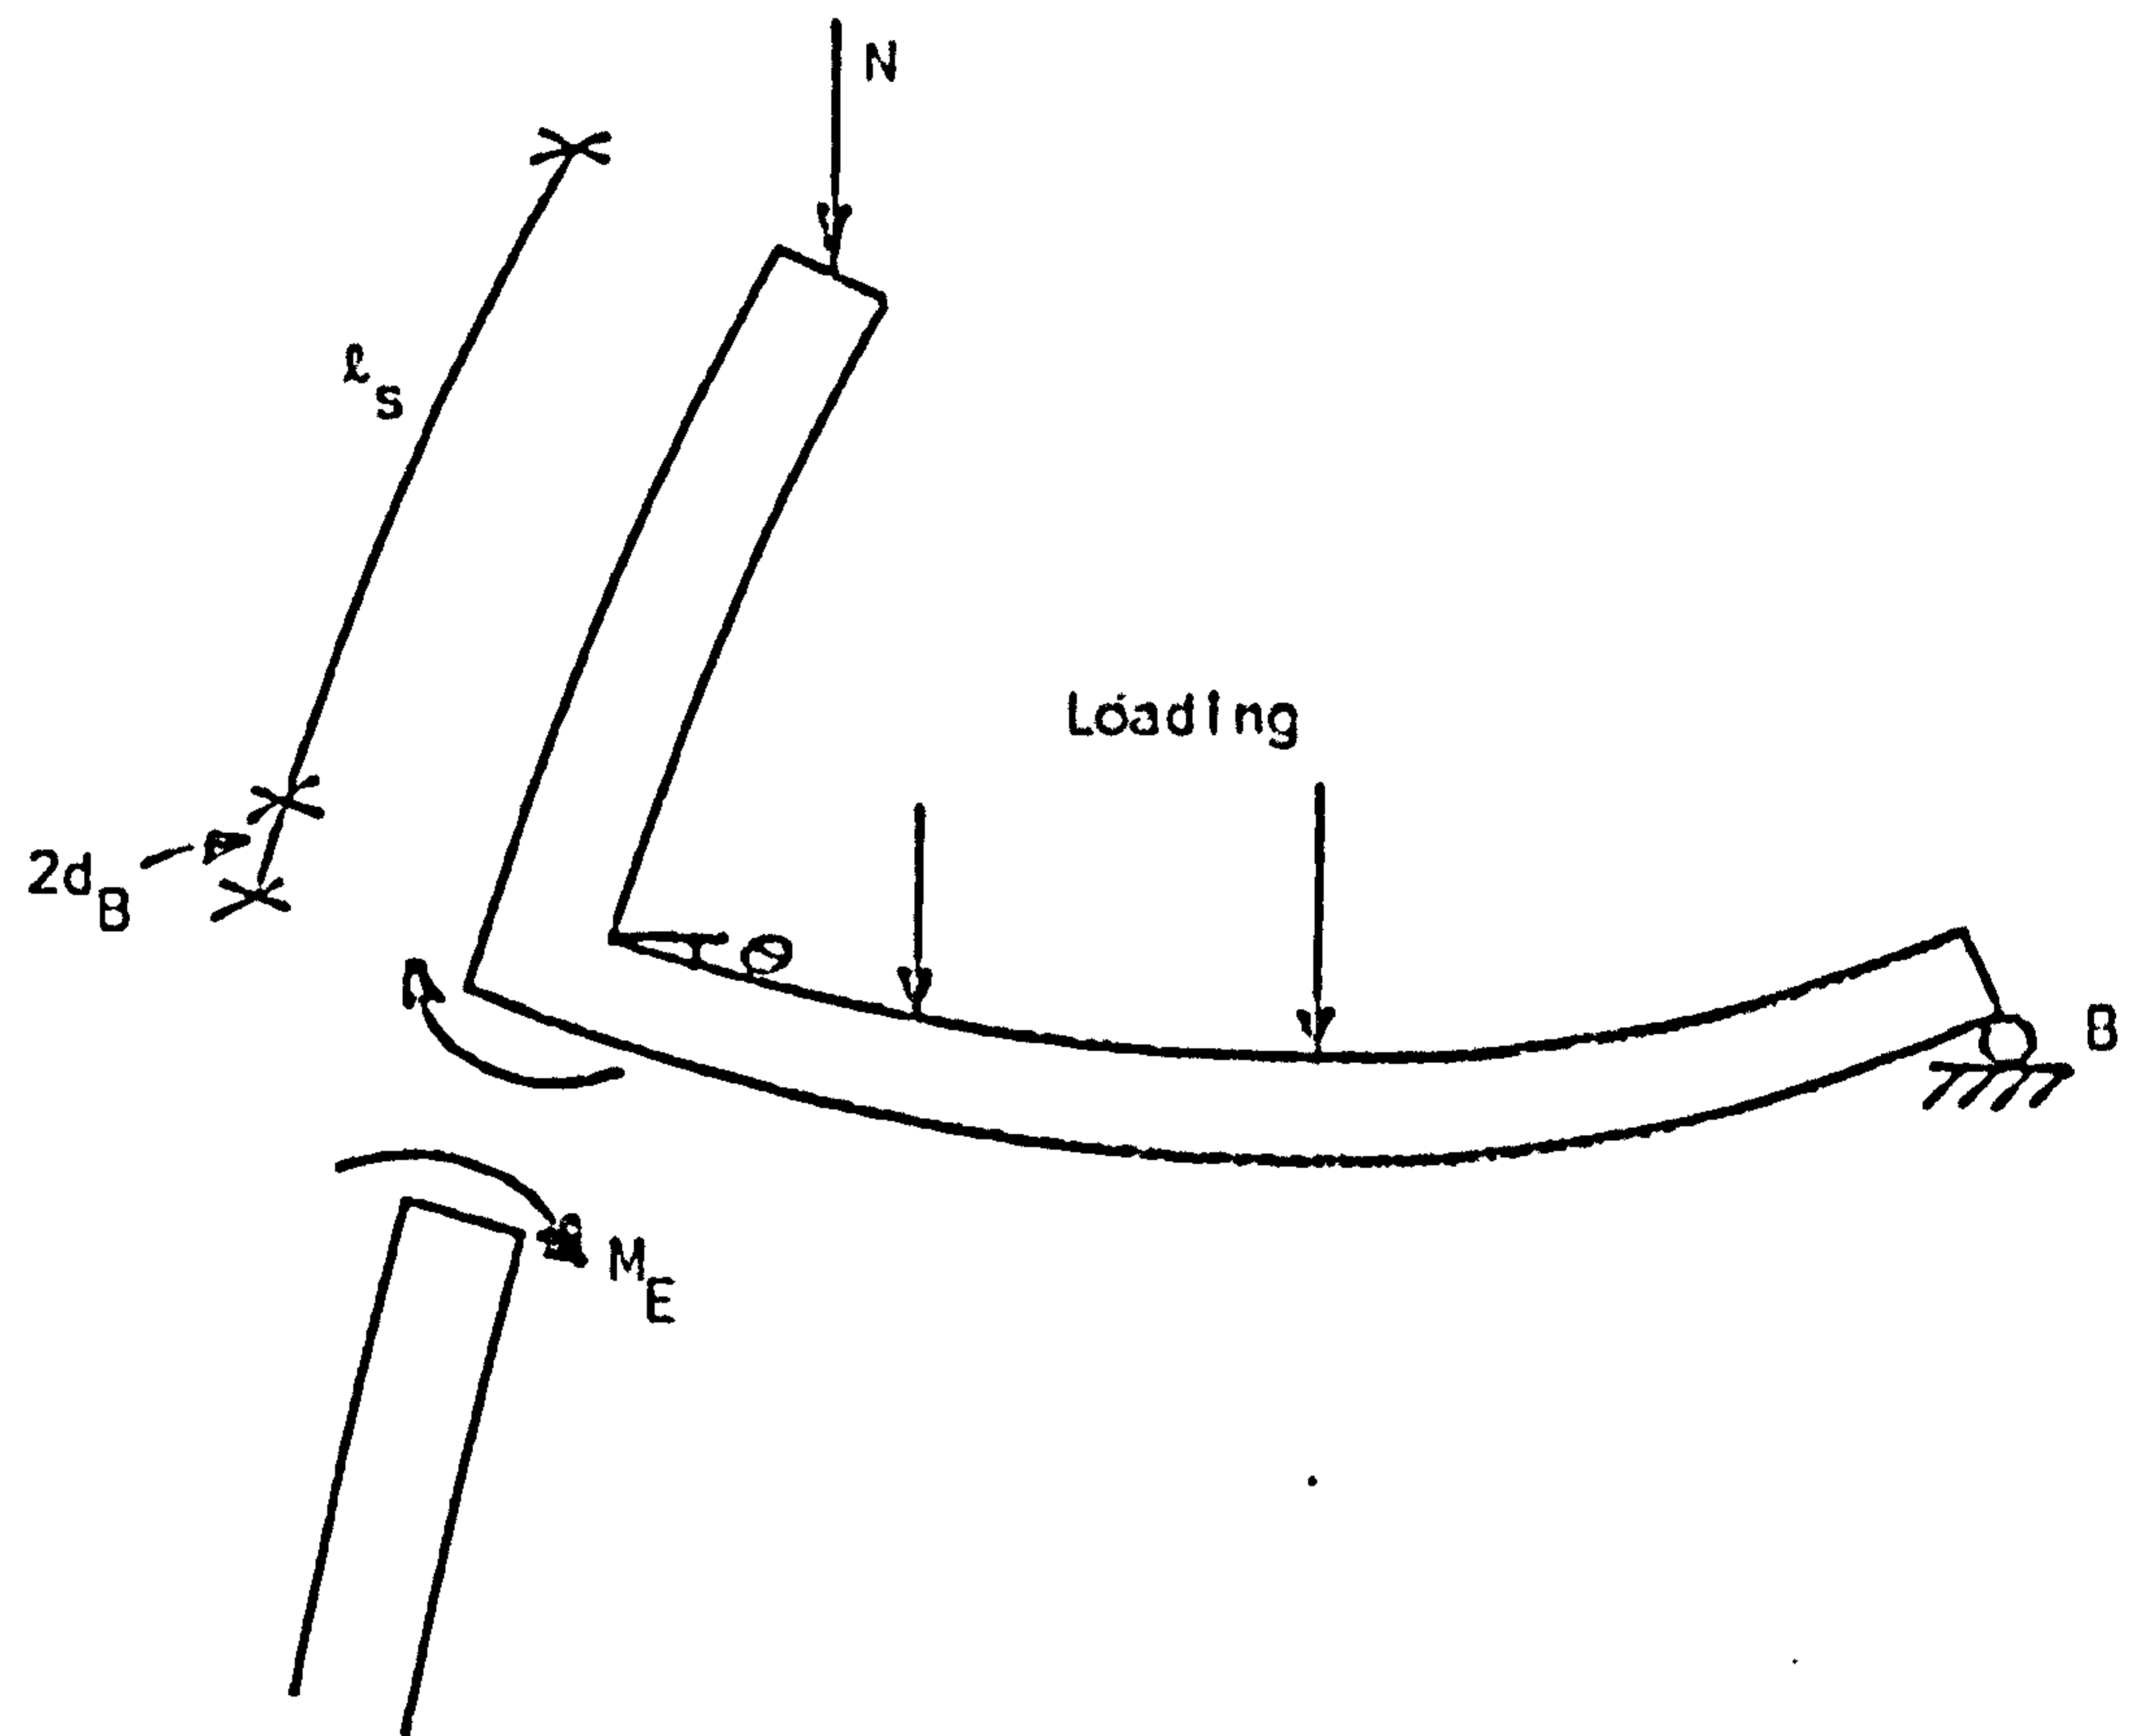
FORCES ON COLUMN-BEAM JOINT
